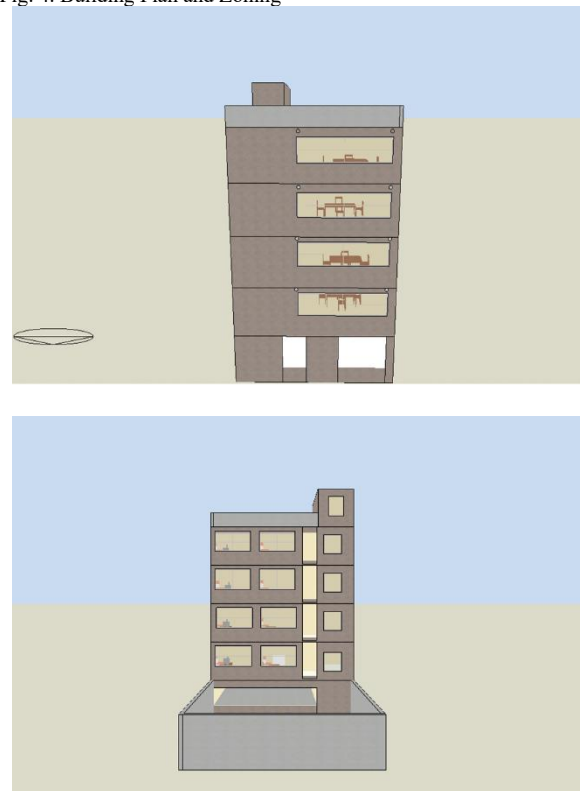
a) Northern Facade of the Building. b) Southern Facade of the Building
